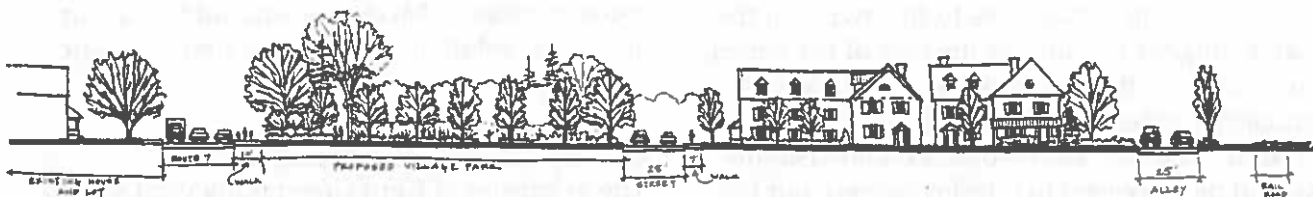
Detail of proposed new public space on Main Street with retail uses facing the square
